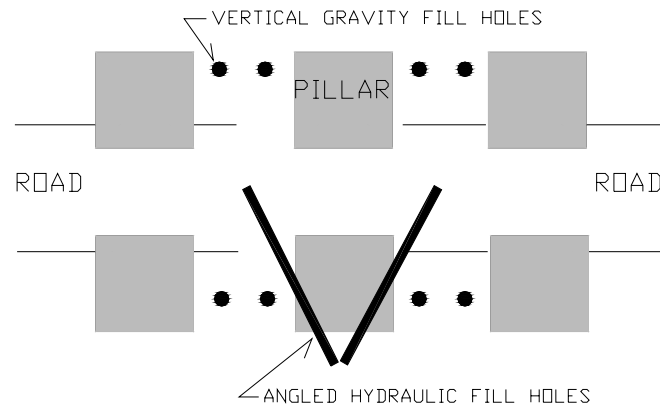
Conceptual plan sketch of gravity fill hole arrangement between mine pillars. These are located on both sides of a road at the surface. Sand-size materials are then pumped into mine voids as a slurry through angled, cased holes for precise placement. Dewatered slurry compacts for firm support.
